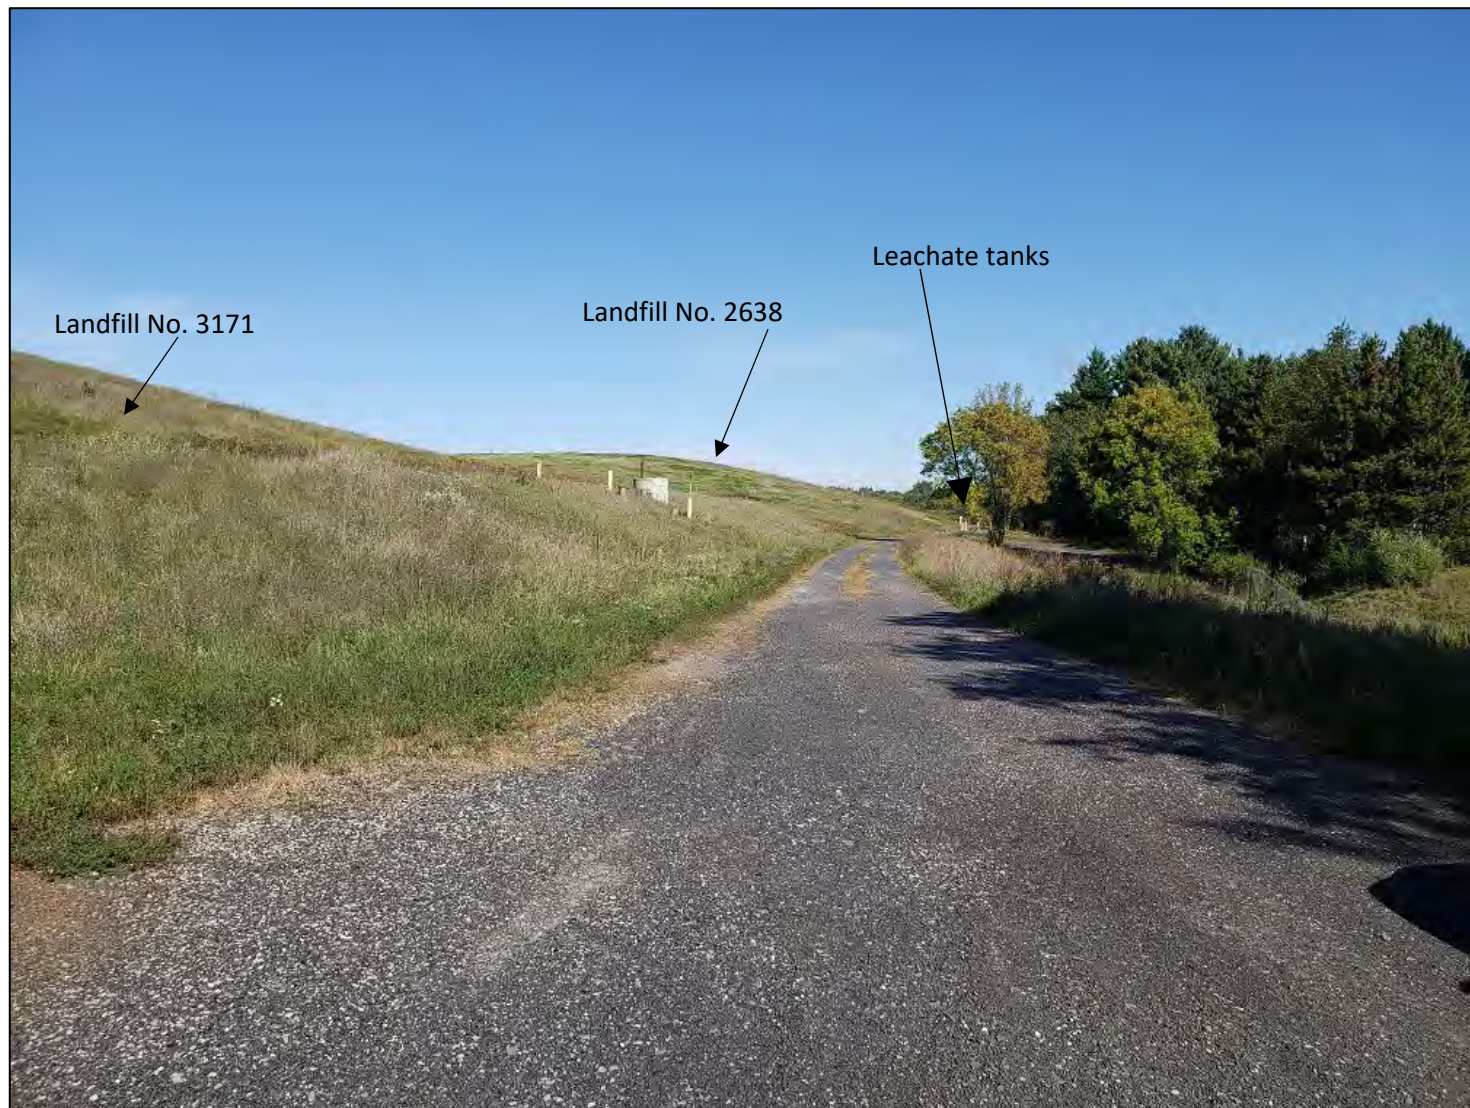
Access road to Landfill No. 2638 and leachate tanks, looking north. Leachate manhole shown on the east side of Landfill No. 3171.
